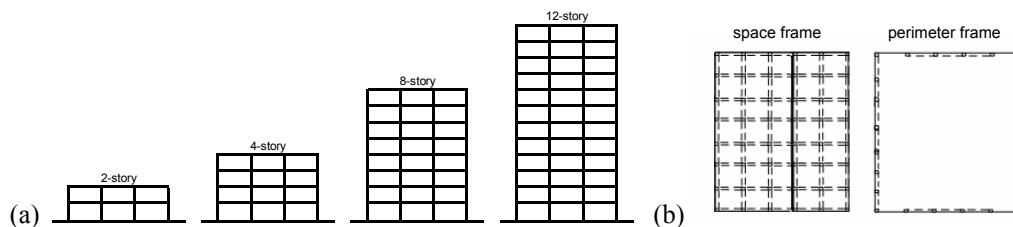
Archetype non-ductile RC frame structures illustrating (a) frame elevations and (b) frame plans.
